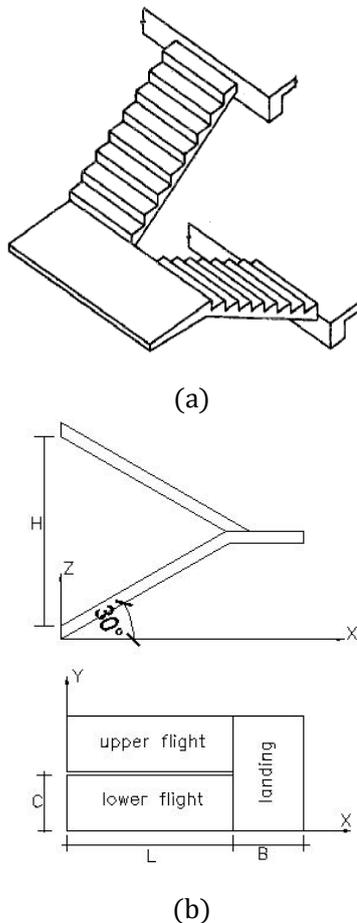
Stair slab geometry, (a) elevation, (b) plan
